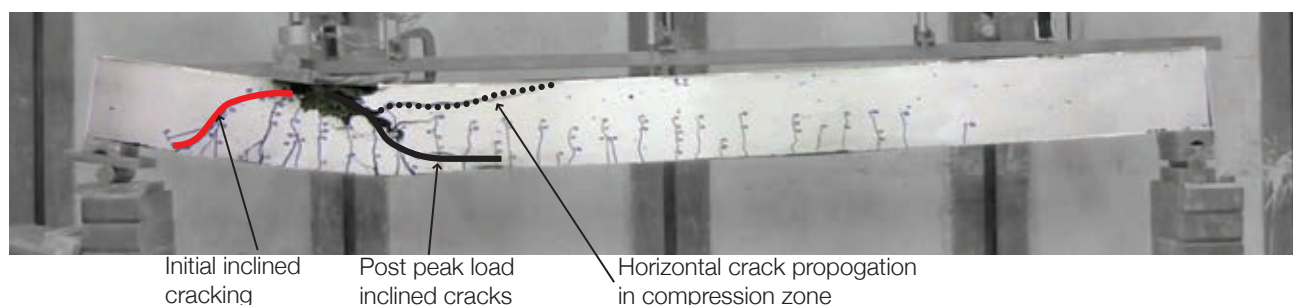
Significant cracking in Beam 10\_2 after the peak load.
